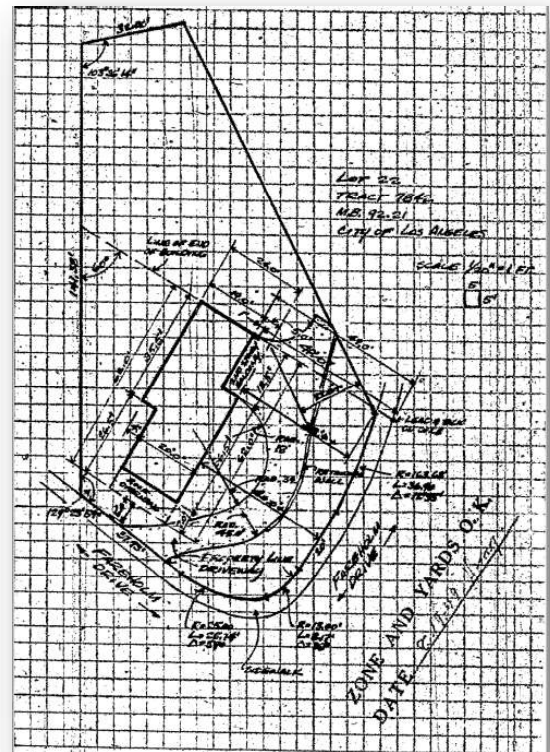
Drawing of Kun House II from original building permit application showing the positioning of the home on its site, 1949 (Source: Los Angeles Department of Building and Safety)
